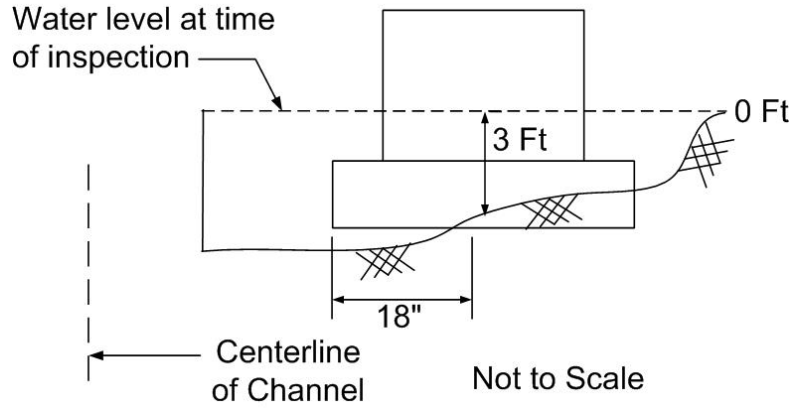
Inspection Sketch of Scour at a Pier
